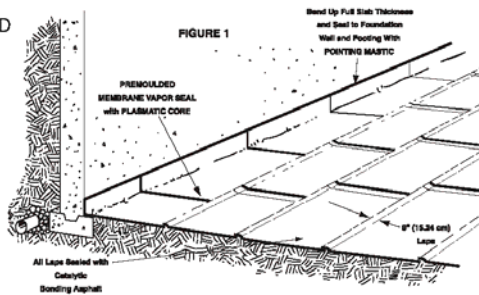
Example Under Slab Waterproofing System – WR Meadows PMPC
